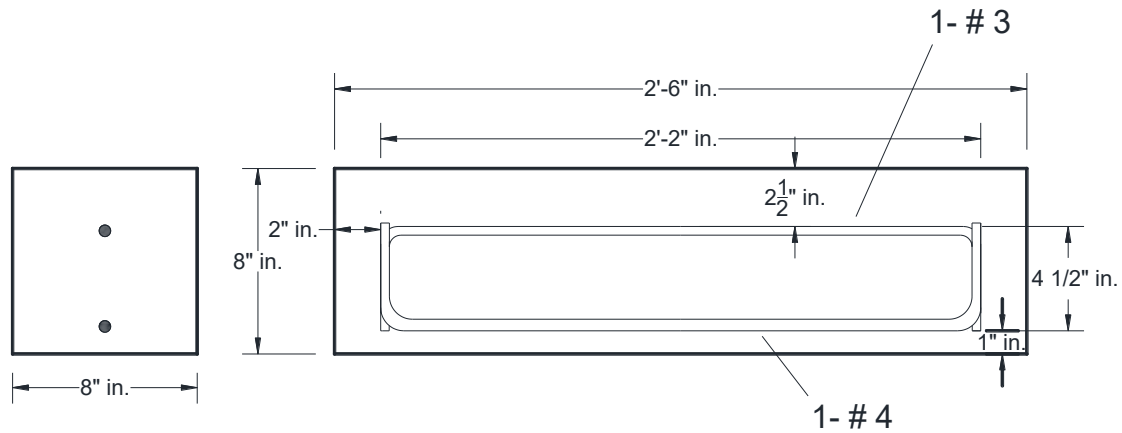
(a) Cross-sectional and (b) elevation view of 8 in. x 8 in. x 30 in. overlay specimens
